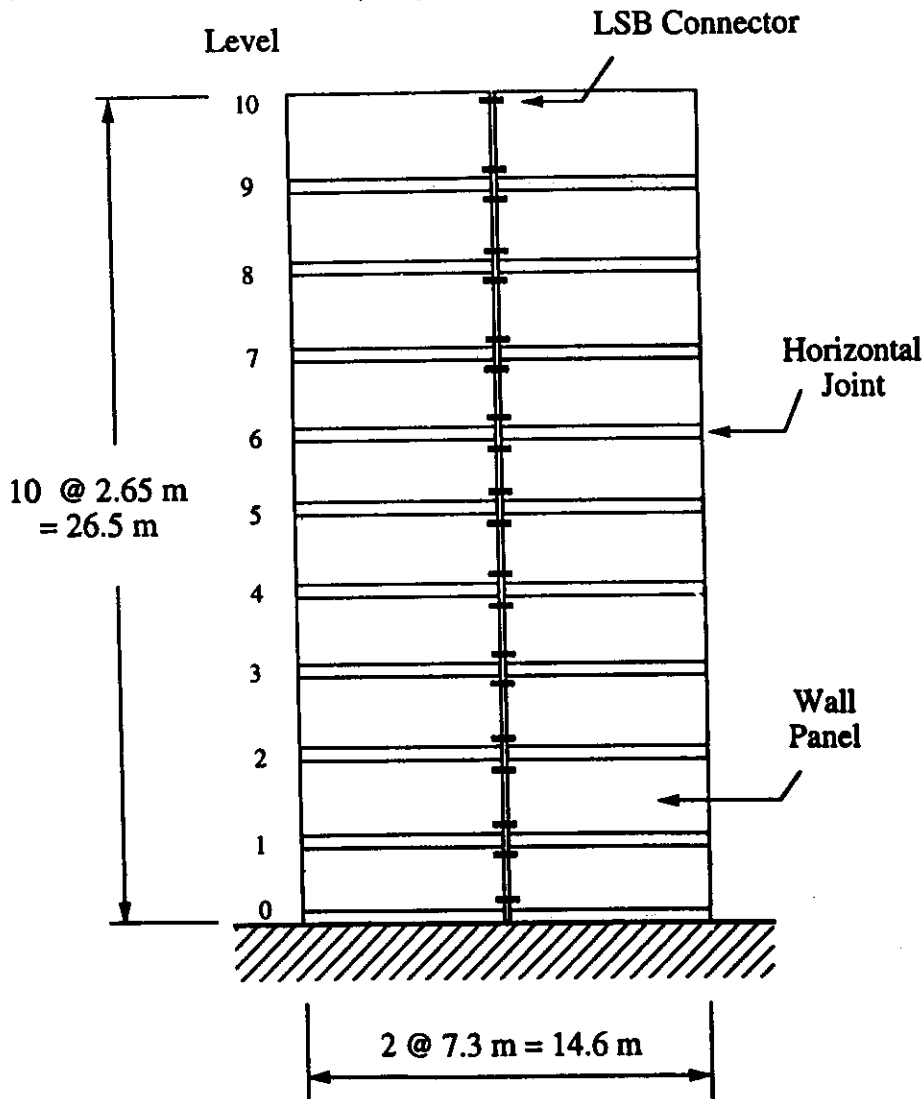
Prototype precast panel end wall equipped with LSB connectors
